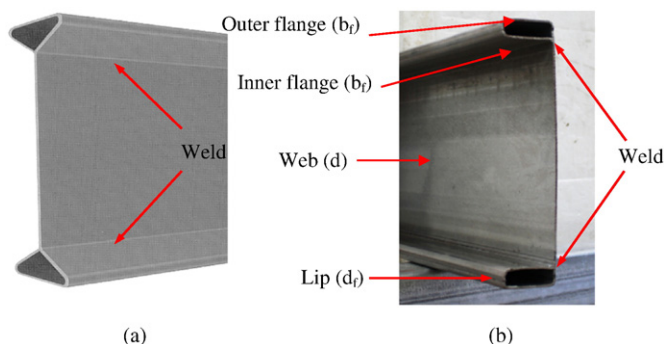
Welded hollow flange sections, (a) Hollow Flange Beam, (b) LiteSteel Beam.
